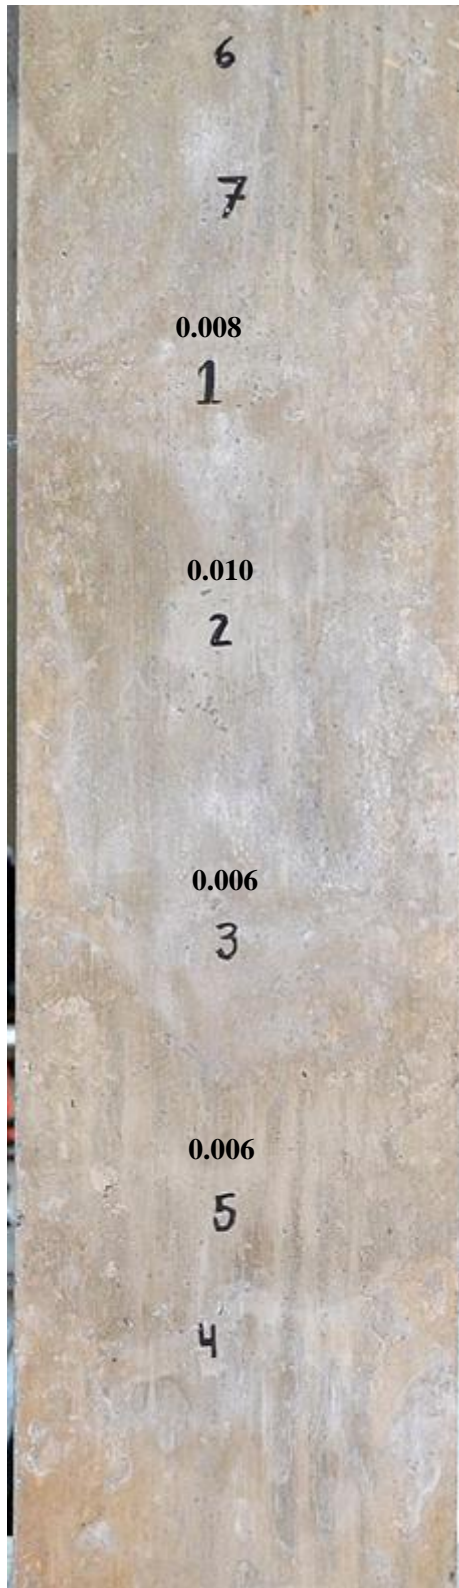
Cracks on east face of TS01 at Load Step 13
